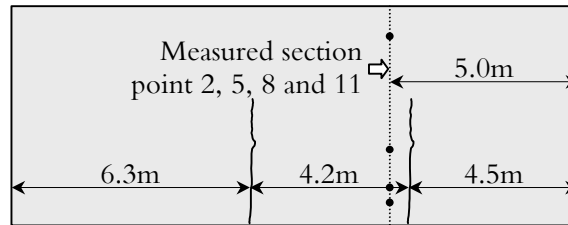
Observed cracking in the studied wall, from Thomassen (1999).
